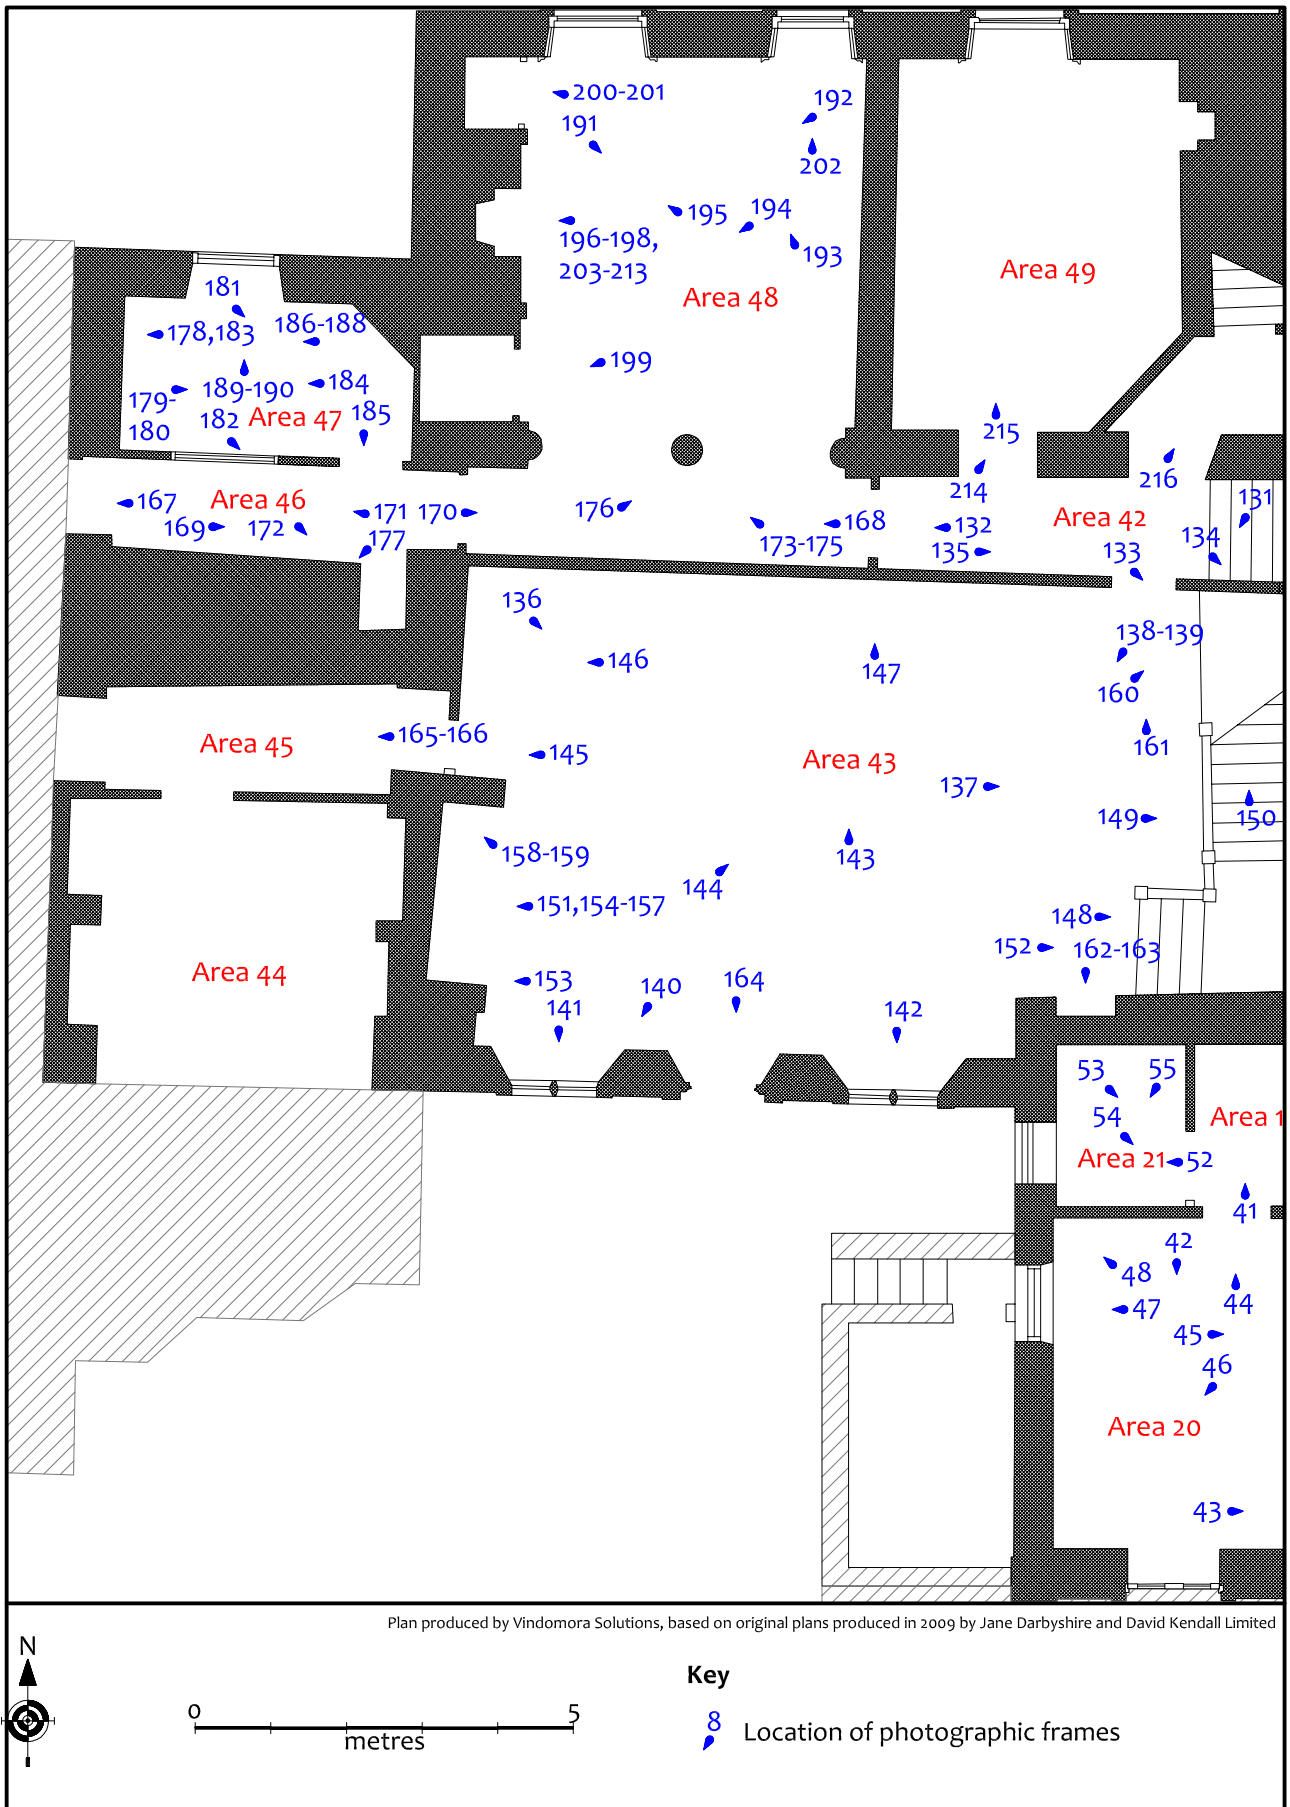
Ground floor plan showing location of photographic frames. Areas 19-21, 42-49
